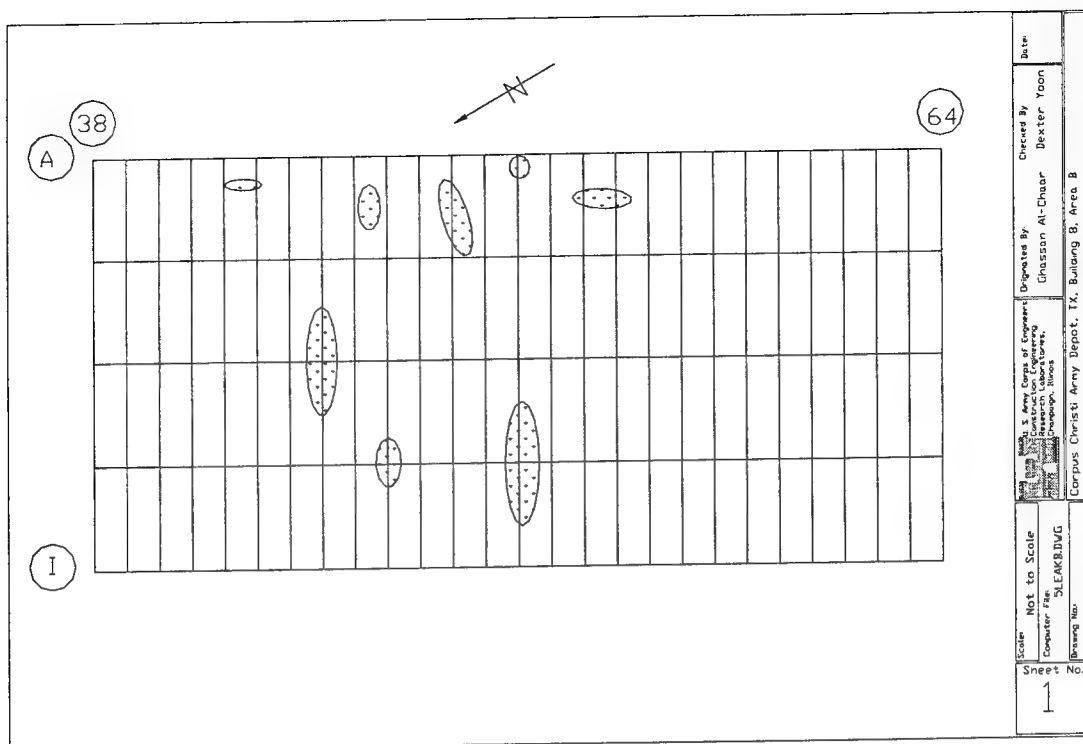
Location of leak traces and roof surfaces collecting water in Area B.
